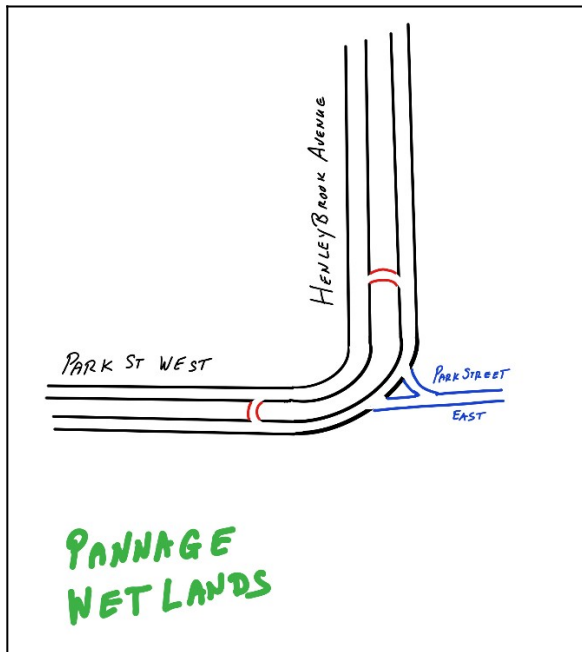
A sketched redesign option for the Henley Brook Avenue and Park Street intersection. Traffic going south on Henley Brook Ave can turn left in to Park St. From Park St East going west a slight left turn. From Park Street East onto Henley Brook Ave continue west till U-turn option and then go north. From Park St West into Park St East turn into Henley Brook Ave and then use the U-turn option to go south to the left turn to go east.
